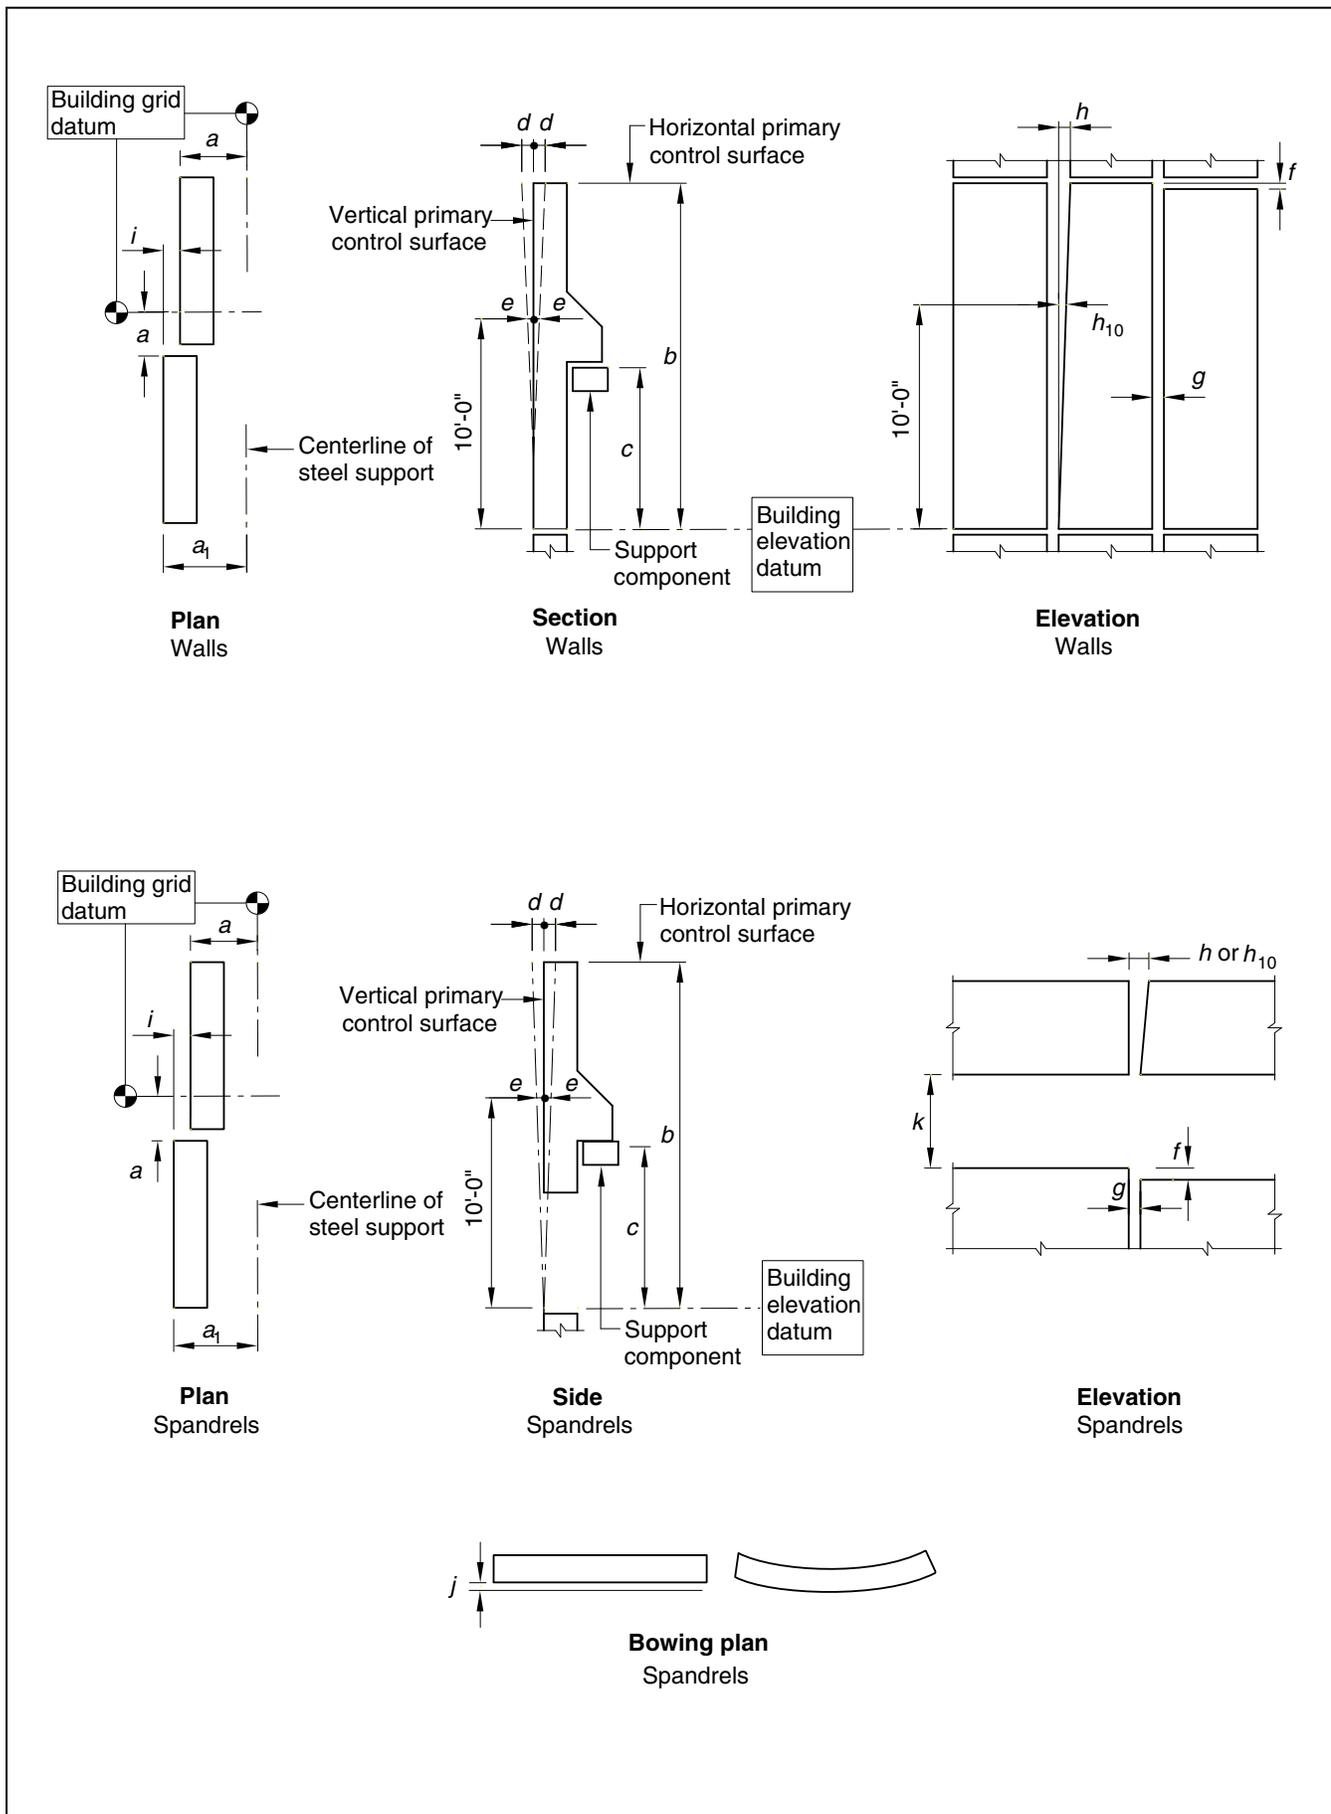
Structural wall panel erection tolerances (cont.)
